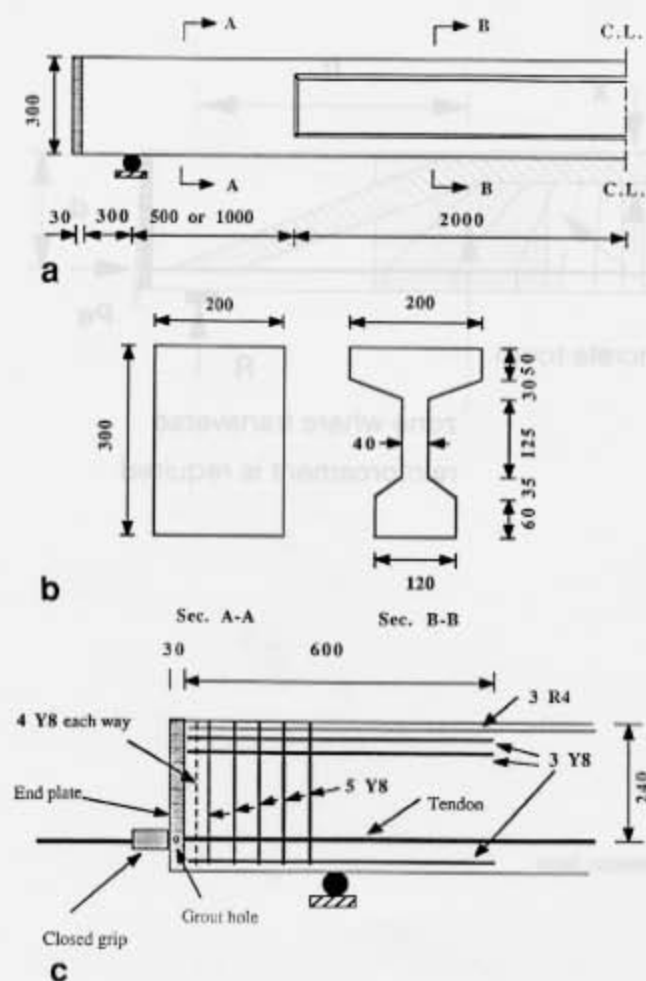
(a) and (b) cross-sectional characteristics; (c) reinforcement details of end zones of prestressed concrete beams tested in programme (all dimensions and bar sizes in mm)
